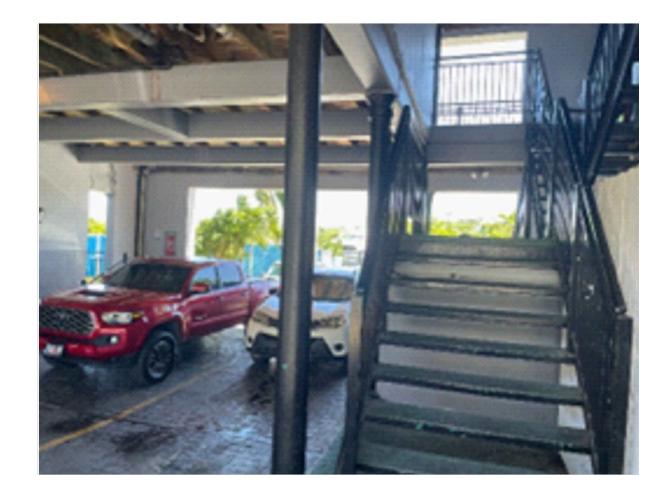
INTERIOR VIEW OF CENTRAL OPEN AREA LOOKING SOUTH ON 1ST FLOOR FOR PROPOSED MODIFICATIONS - BUILDING A
